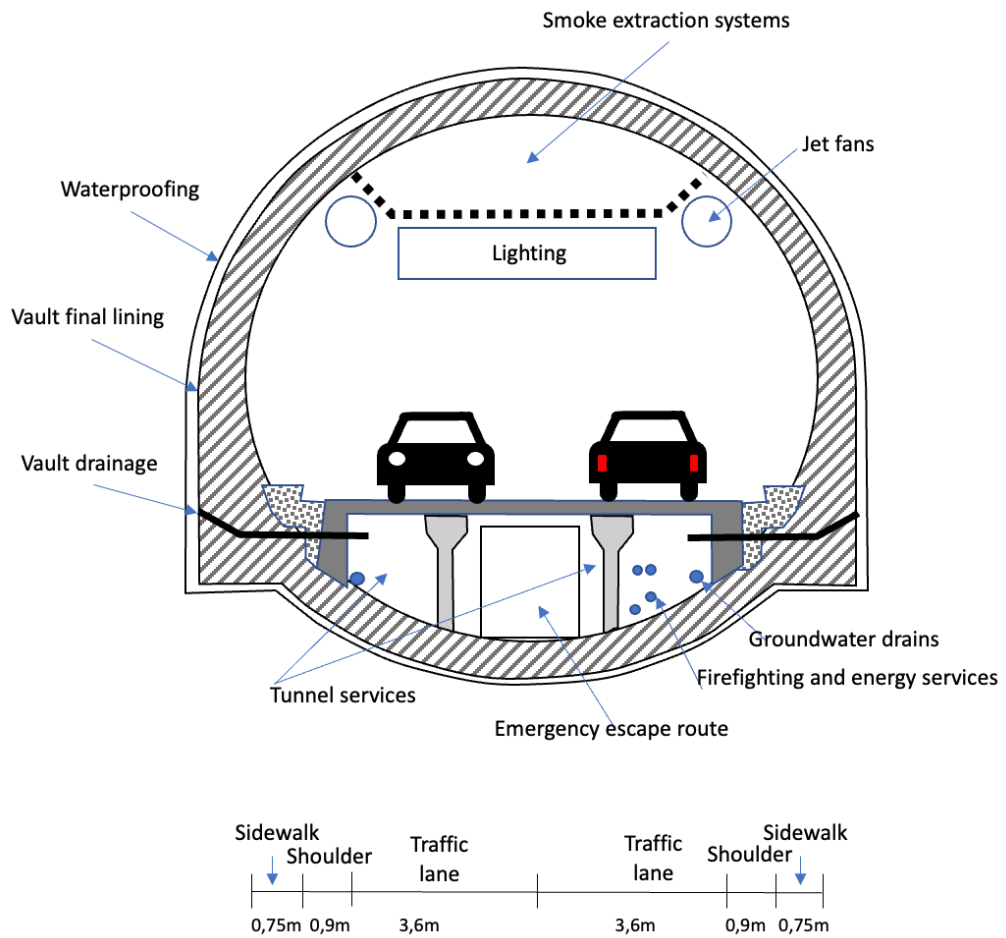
Schematic Typical Cross-Section of the Bargushat Tunnel
